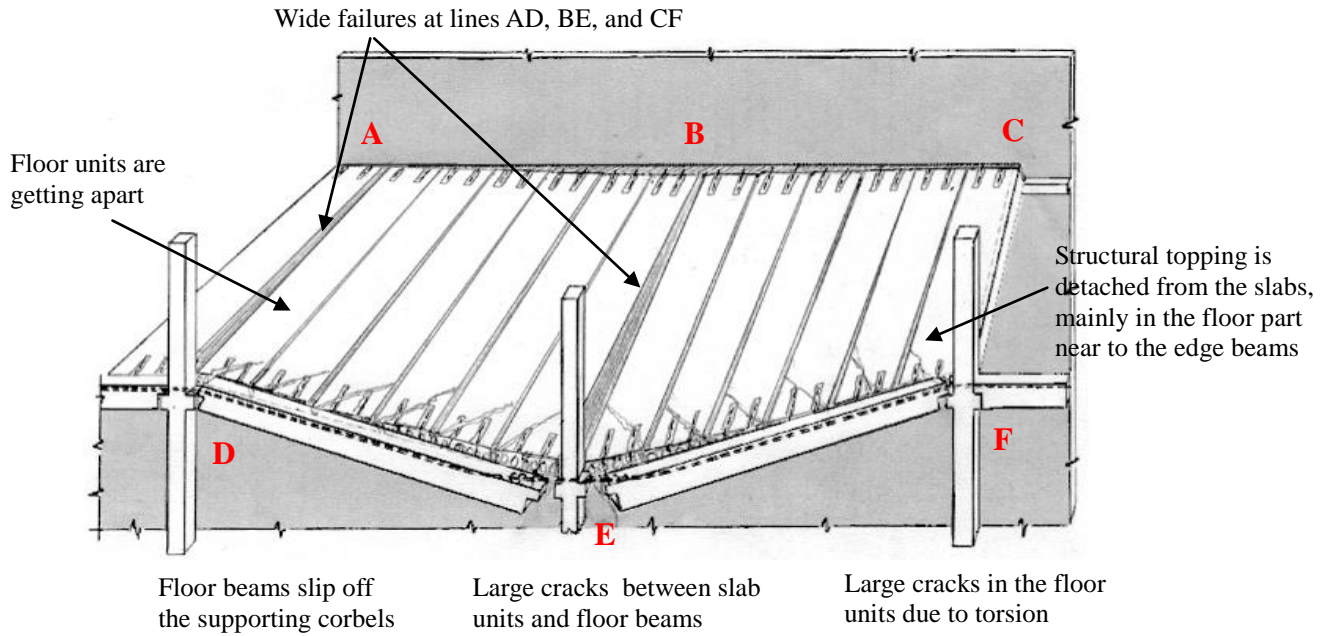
Possible scenario of the structural behaviour of a precast frame structure after sudden column loss due to accidental actions
